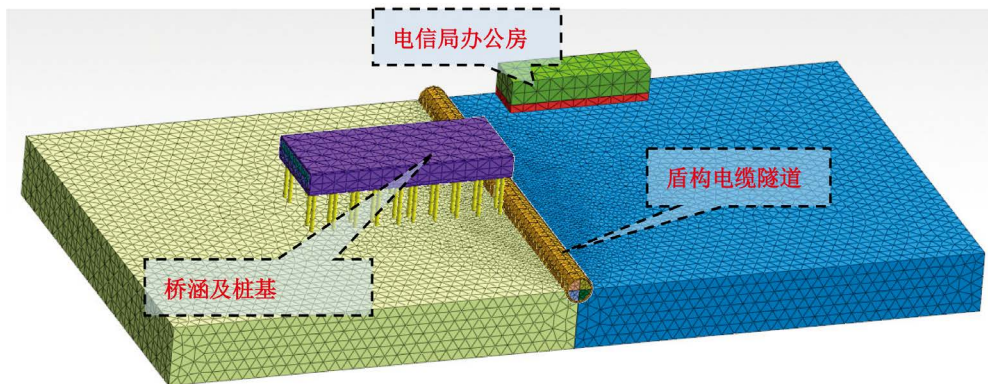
Axonometric model of shield cable tunnel, bridge and building
